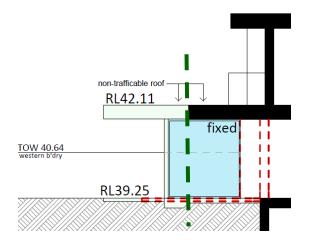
Rear external wall to not extend past the existing overhang (as dotted green). (Source: P & S Design and Construction Pty Ltd, 2022).
